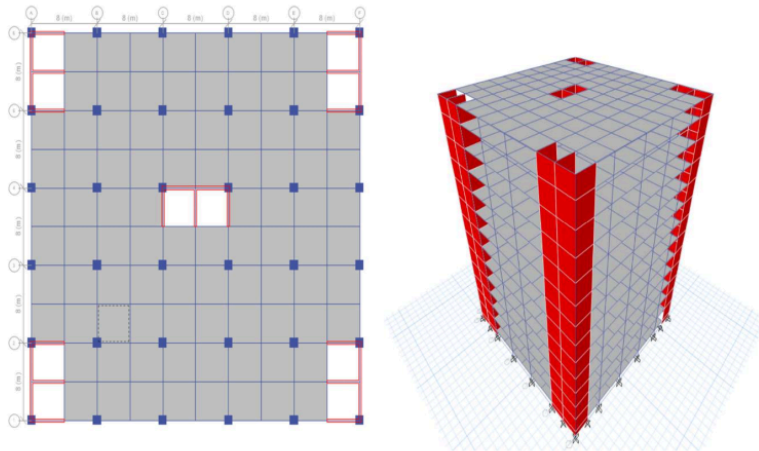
(a) Plan and 3-D view of Model M1 (reference model)
